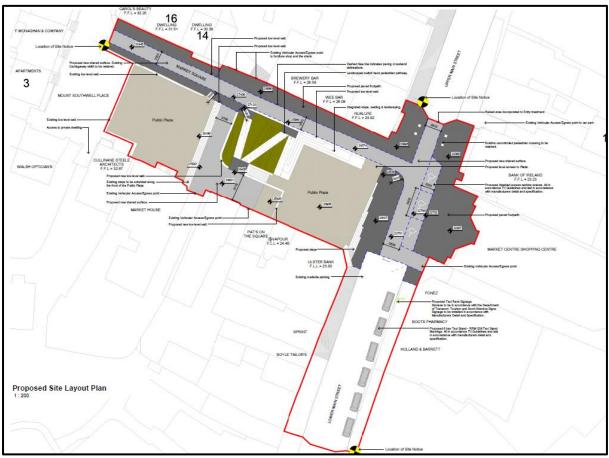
Site Plan Layout – (source – Donegal Co Co)
